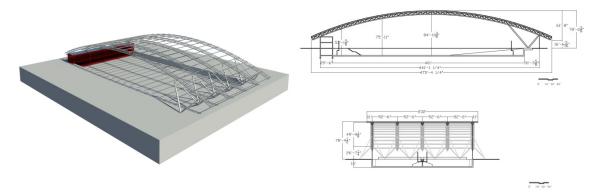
B. Lyons, R. Marshall, & B. Westergaard. Structure for the Indoor Practice Stadium.
